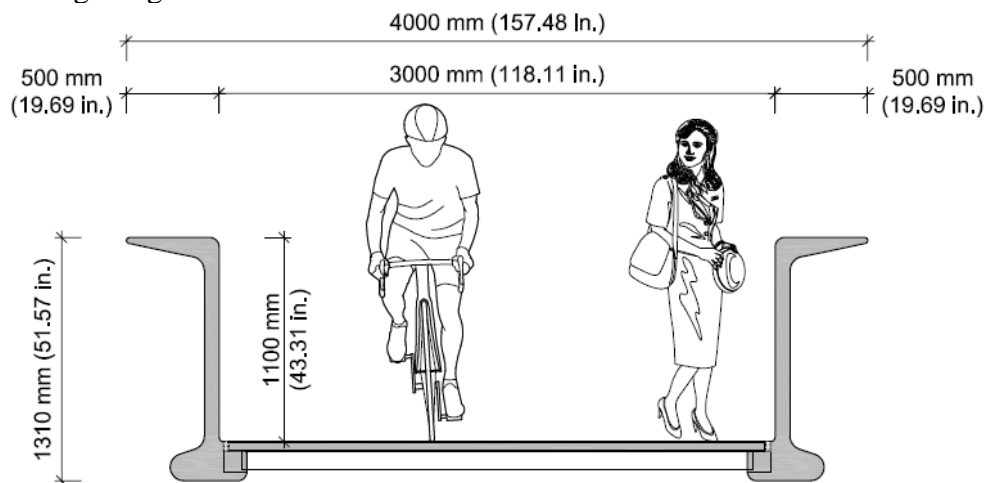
Schema of cross-section of an innovative footbridge structure MSFS
